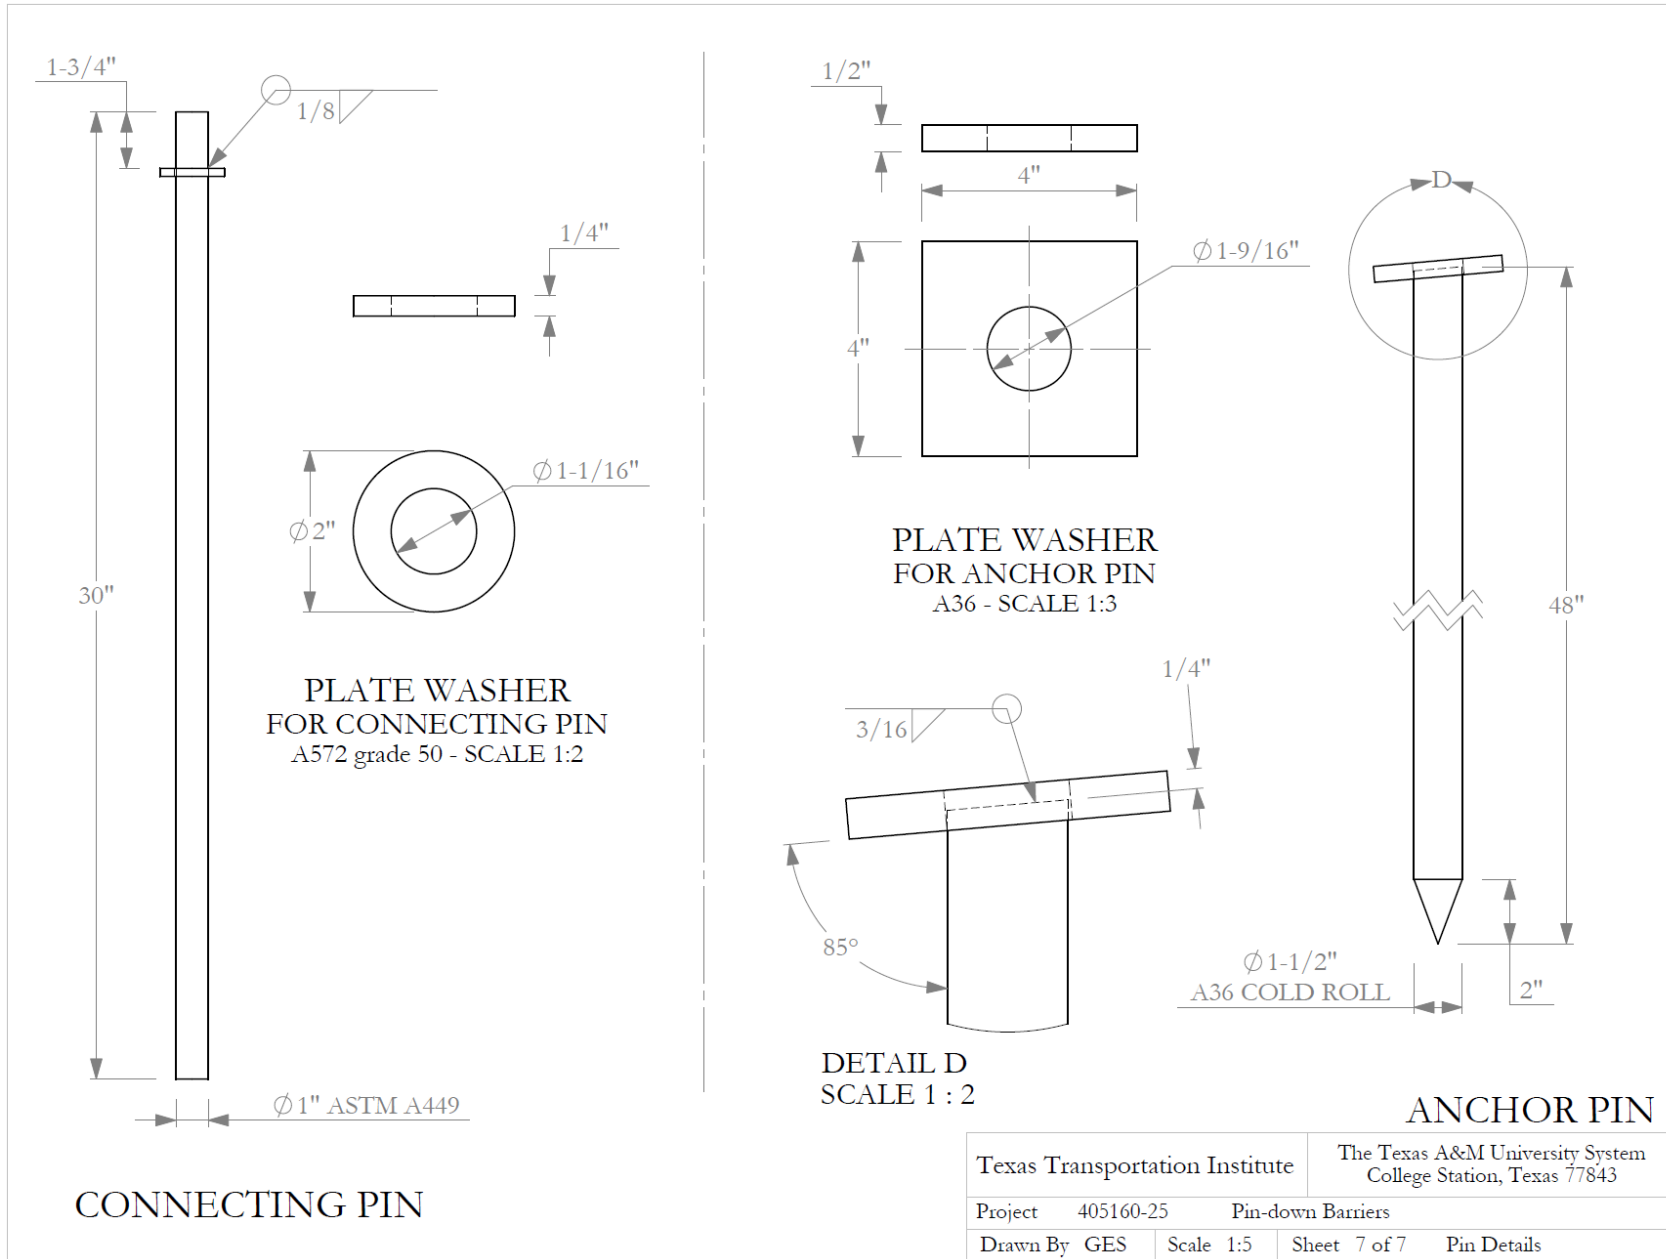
Anchor and connecting pin details for the Temporary Concrete Barrier Pinned on Asphalt.
